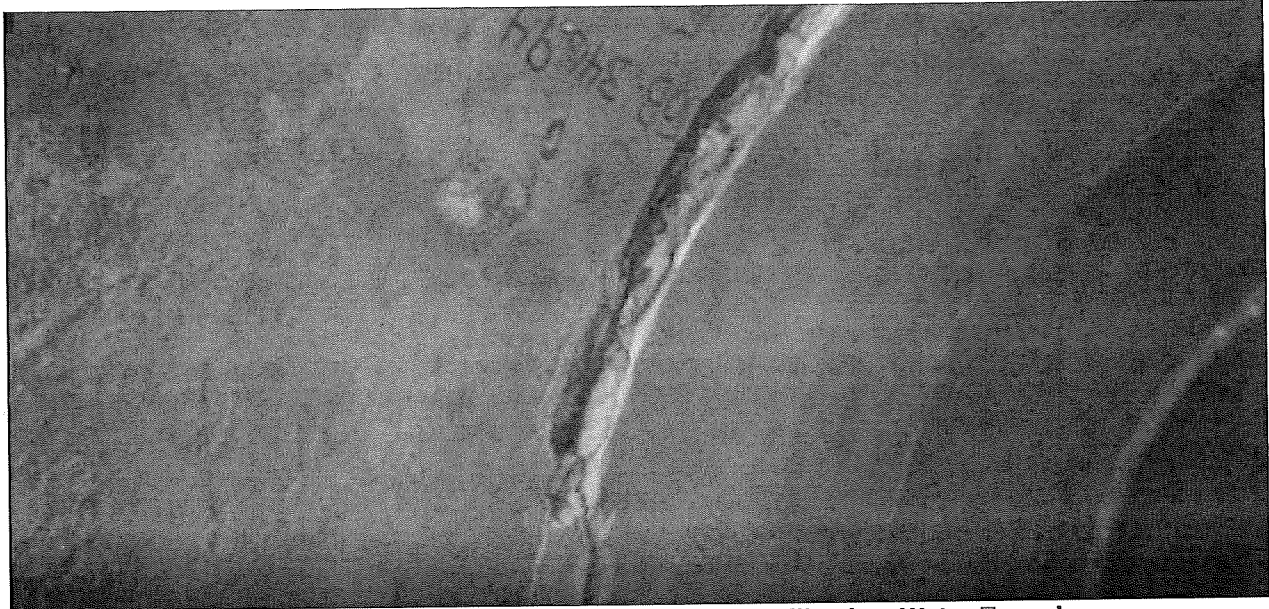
Hibbard Onboard HD Video Showing Spalling in a Water Tunnel
